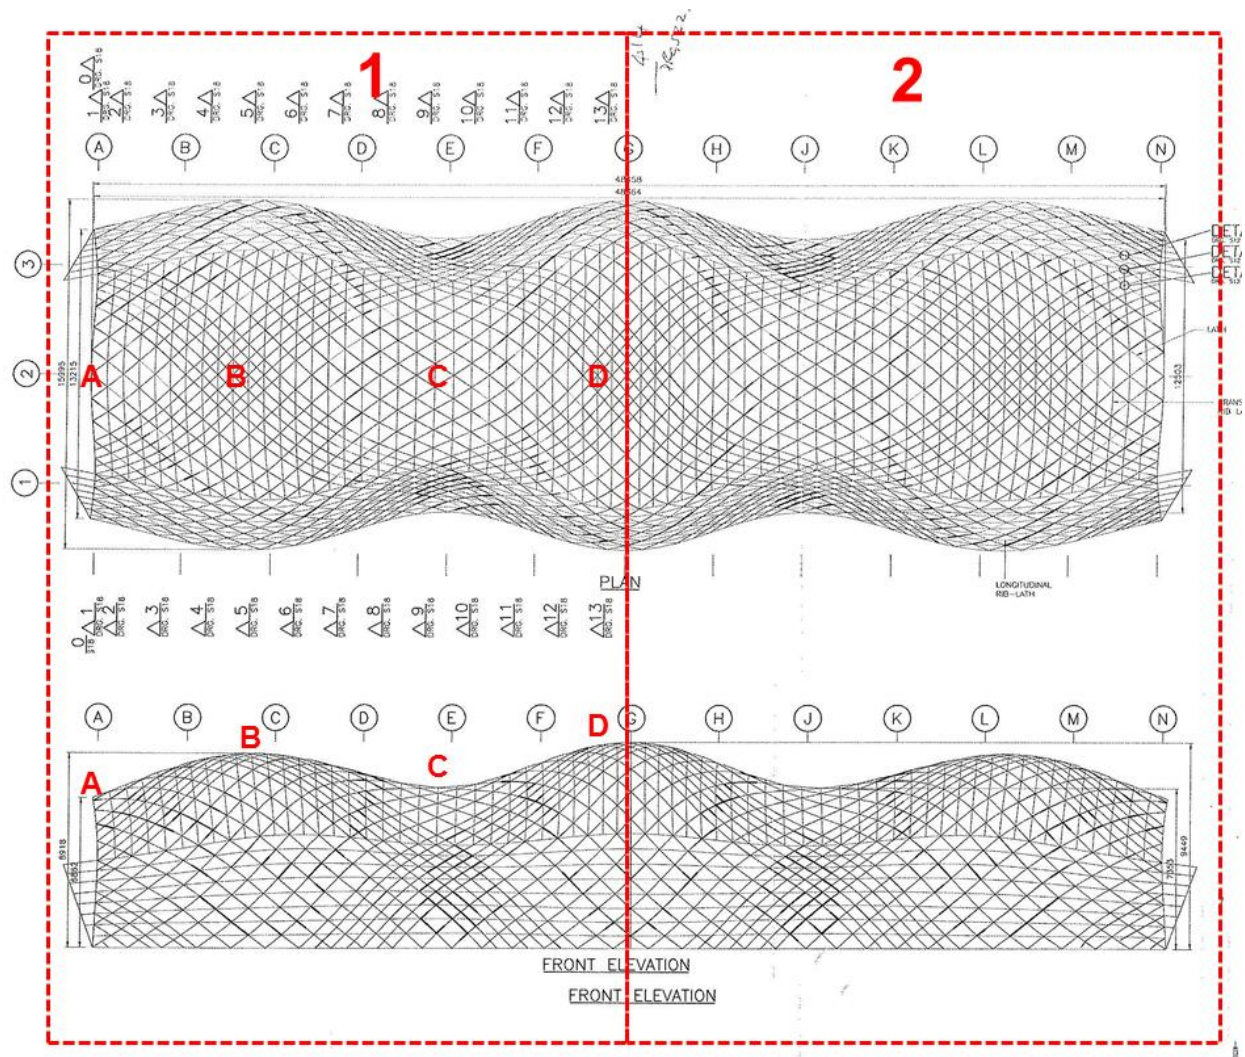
shows the extend of the physical model of the gridshell formwork to be constructed from 2mm intersecting GFRP rods
